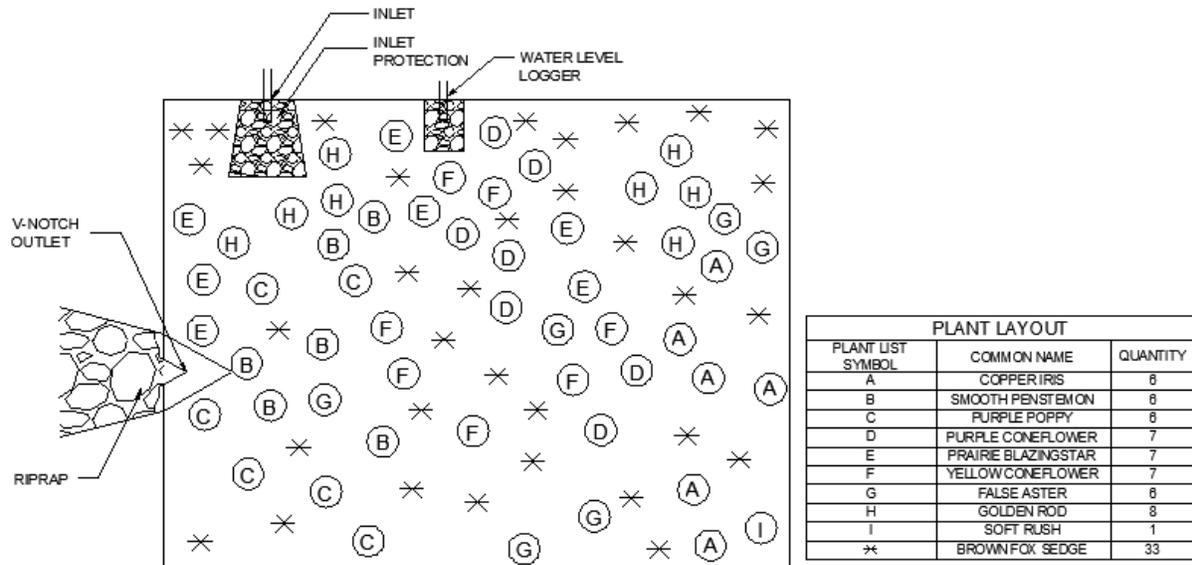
Plan view of Thomas property rain garden plant layout.
